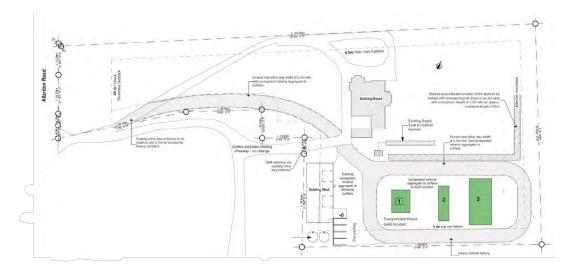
Site plan showing location of proposed building area, driveway and earthworks bund (Source: extracted from site plan included with the application)
